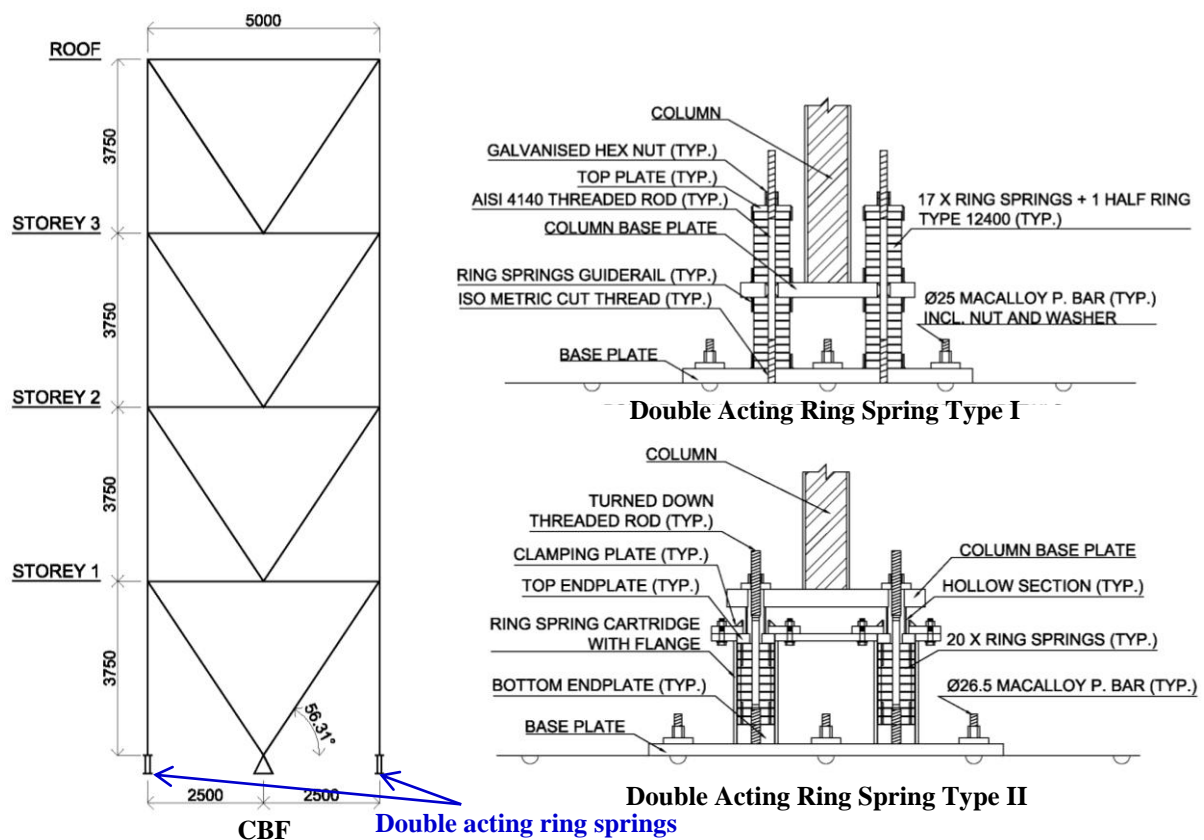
CBF with Rocking System and Double Acting Ring Springs Type I and II
